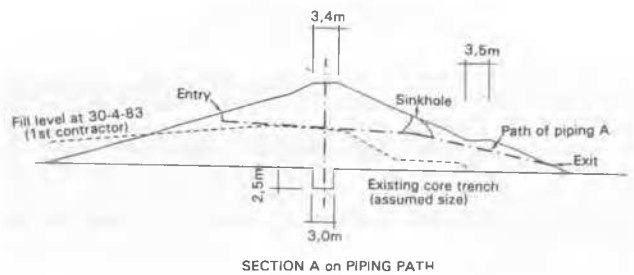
Section through earth dam showing zones constructed by first and second contractors path of piping and sinkhole location.
